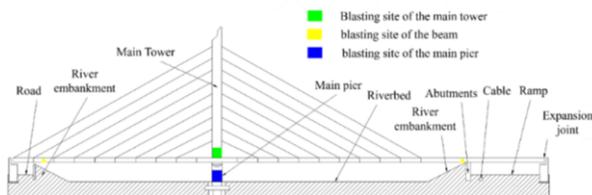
Schematic diagram of Jinwu Bridge structural model.
